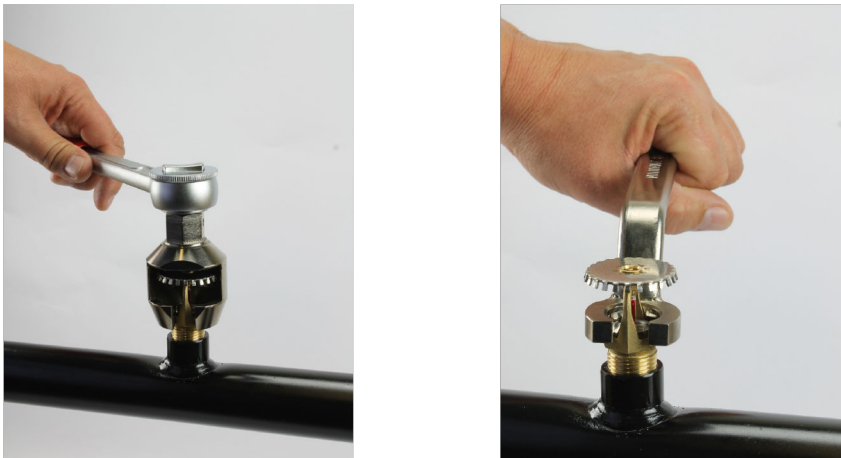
Set the sprinkler socket (left) or sprinkler wrench (right) on the hexagonal bolt
